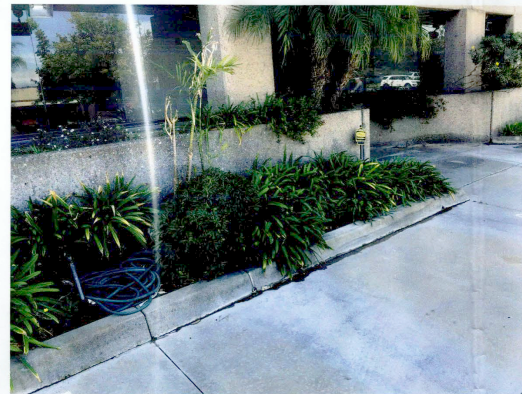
(FRONT ENTRY LANDSCAPE)
